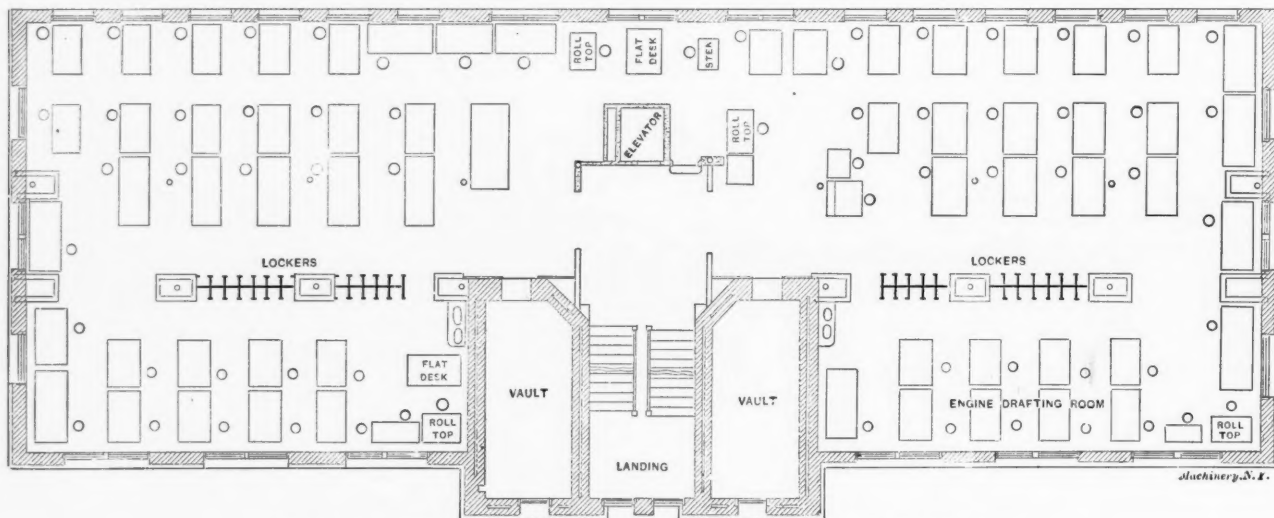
Plan of Third Floor of Office Building, which is Occupied by the Drafting Room.
